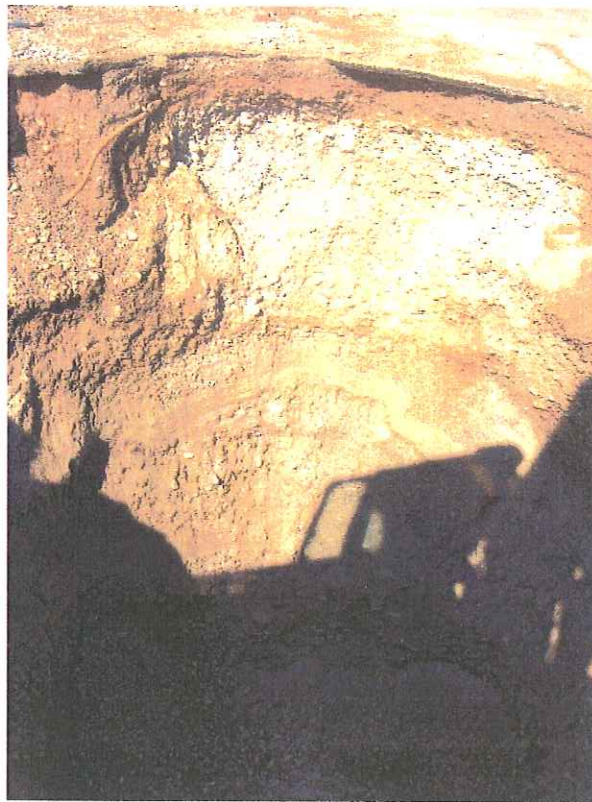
Photograph of northern drywell excavation sidewalls and bottom at final dimensions and limit.
